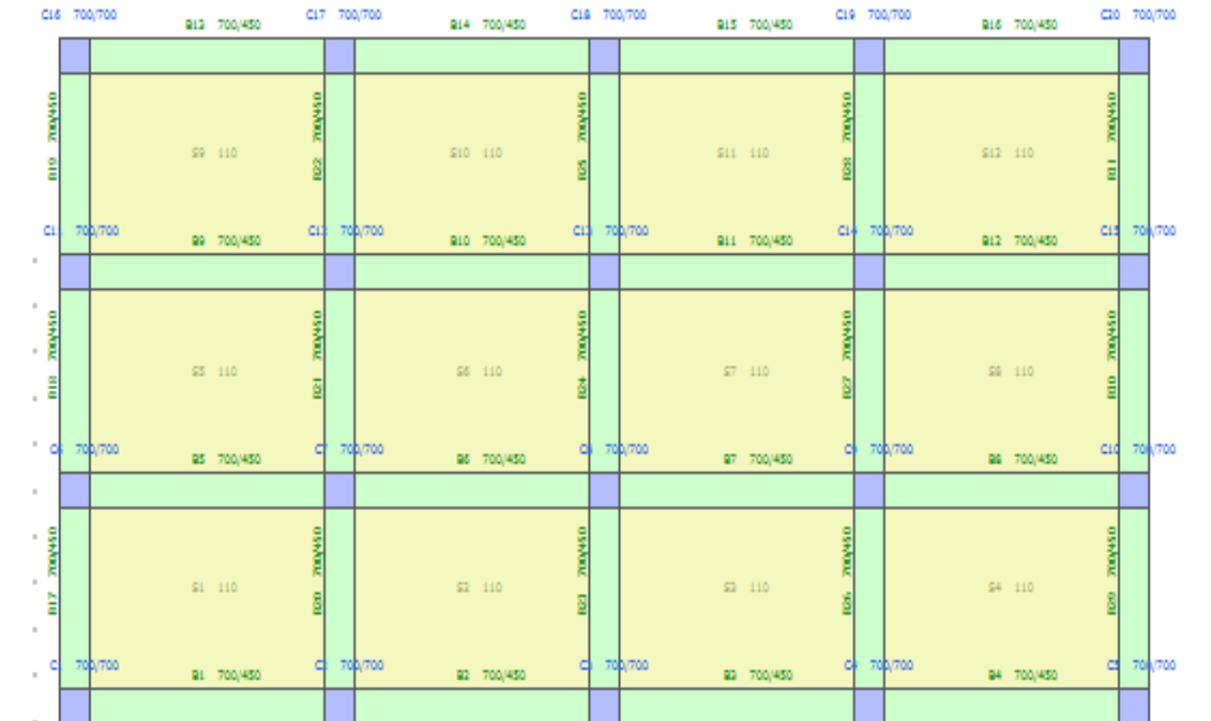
Plan of G+11 building (SeismoBuild Model)
